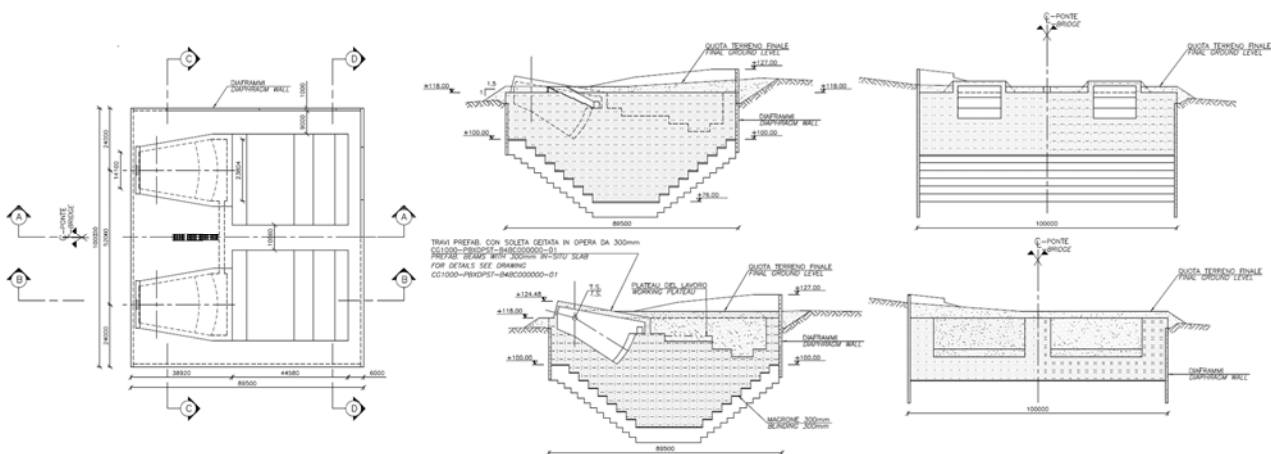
Plan and elevation view of the Calabrian anchor block
